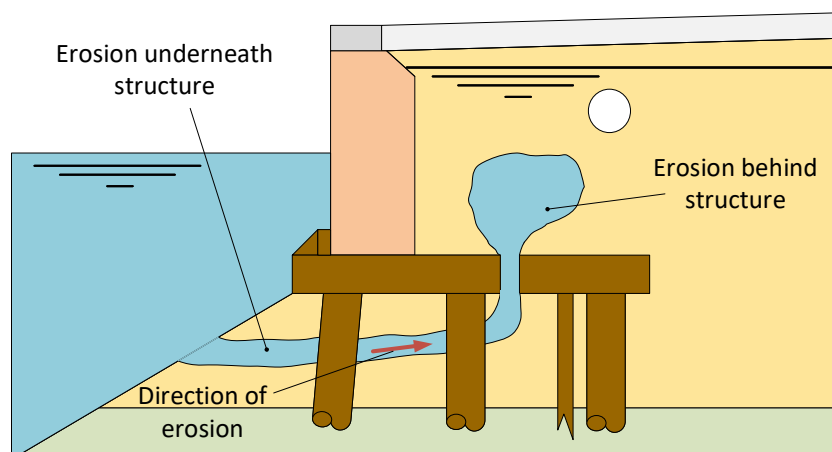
Schematization of erosion underneath- as well as behind the structure due to quay wall floor leakage (exaggerated portrayal).
